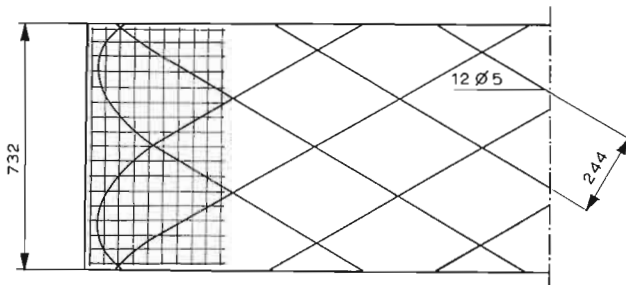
Diagram of prestressed slabs at Crawley (diagonal cable arrangement)
